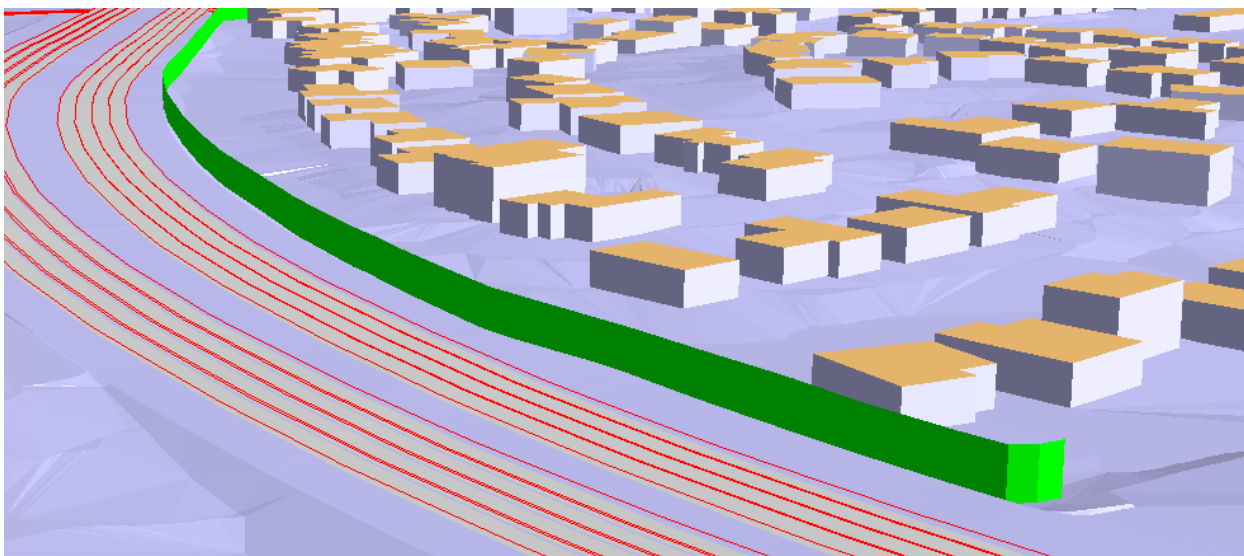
Northern end of Tukara Road to Aspen Street barrier (view from north east)
